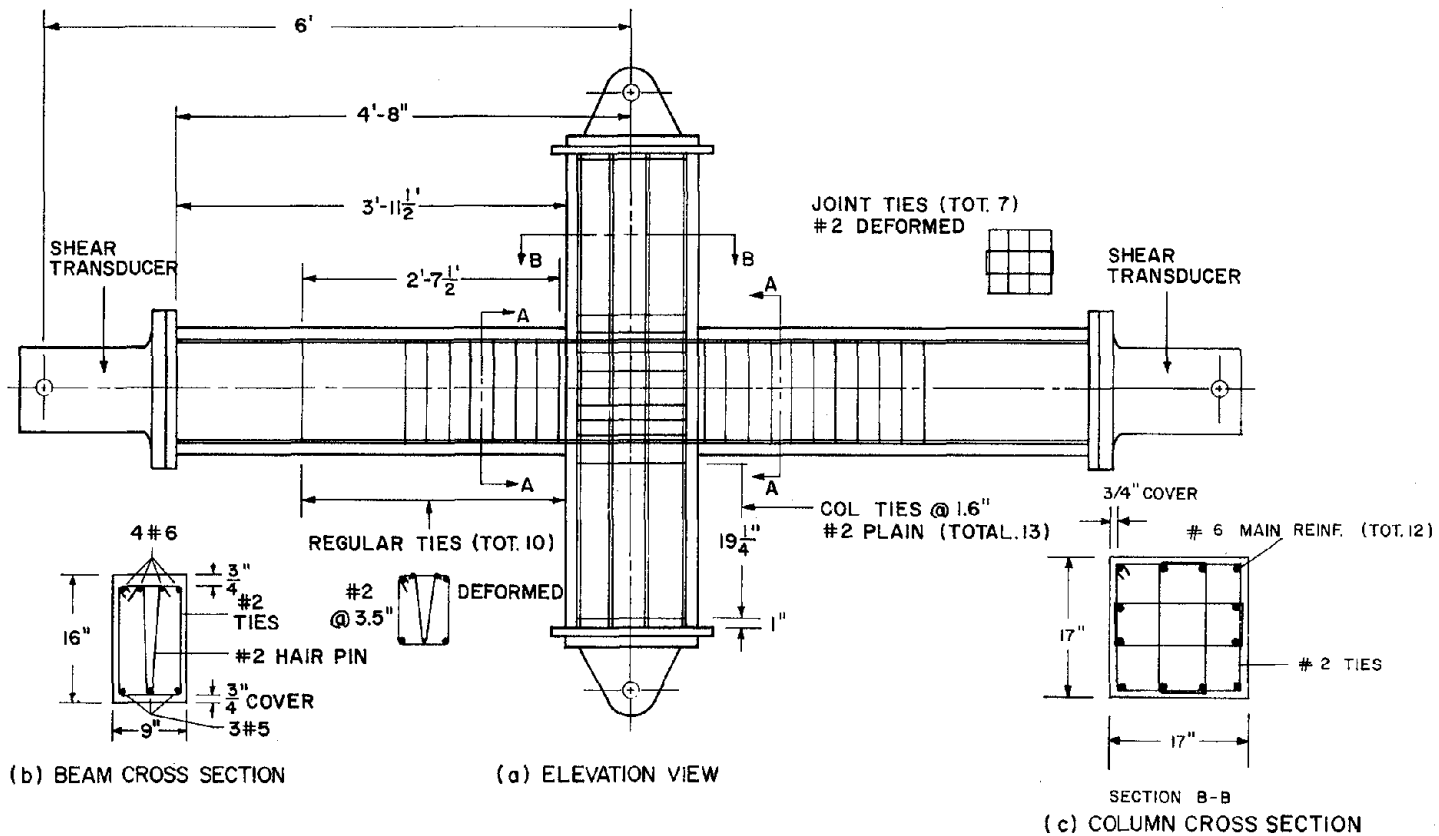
Typical Steel Reinforcement in Beam-Column Subassembly
